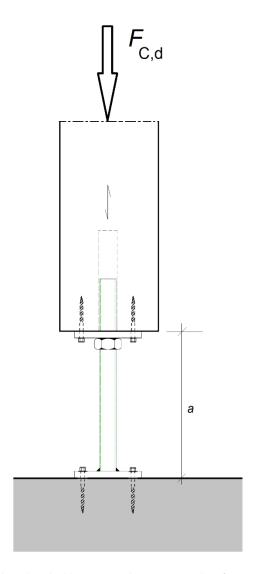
Adjustable Column Leg loaded by a centric compression force.
